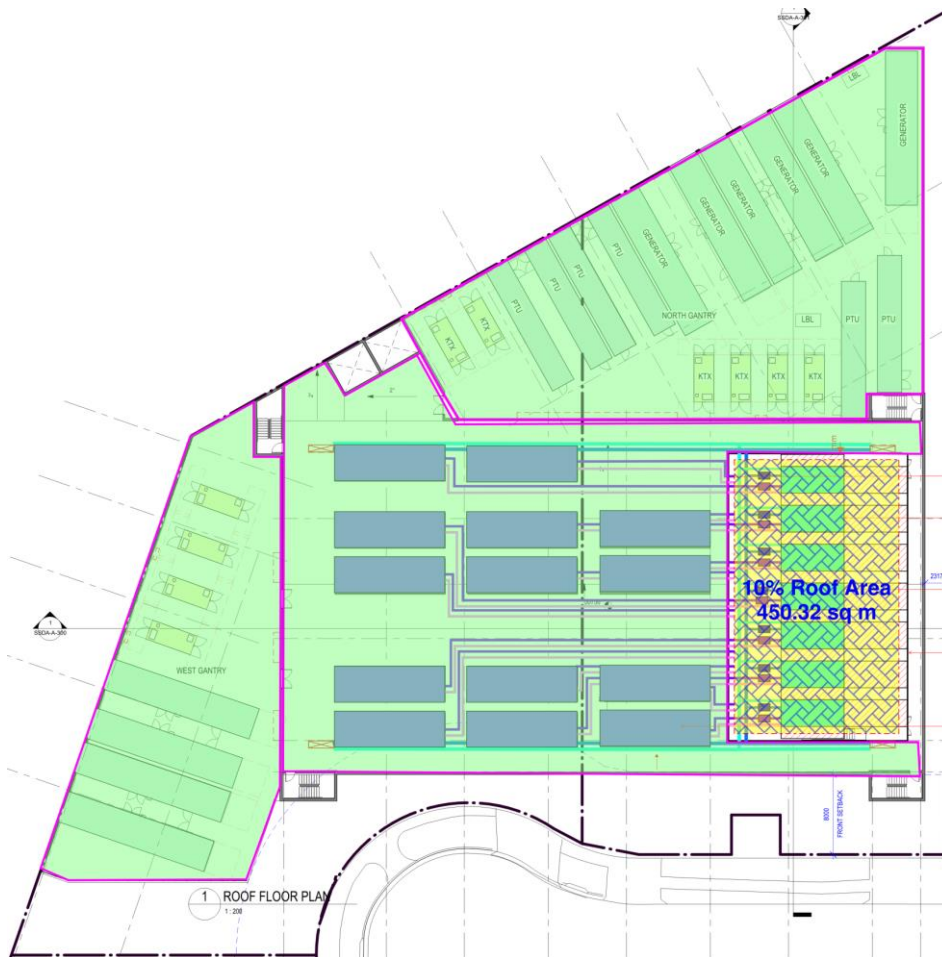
Roof plan, showing mechanical systems (in green) covering more than 50% roof area
